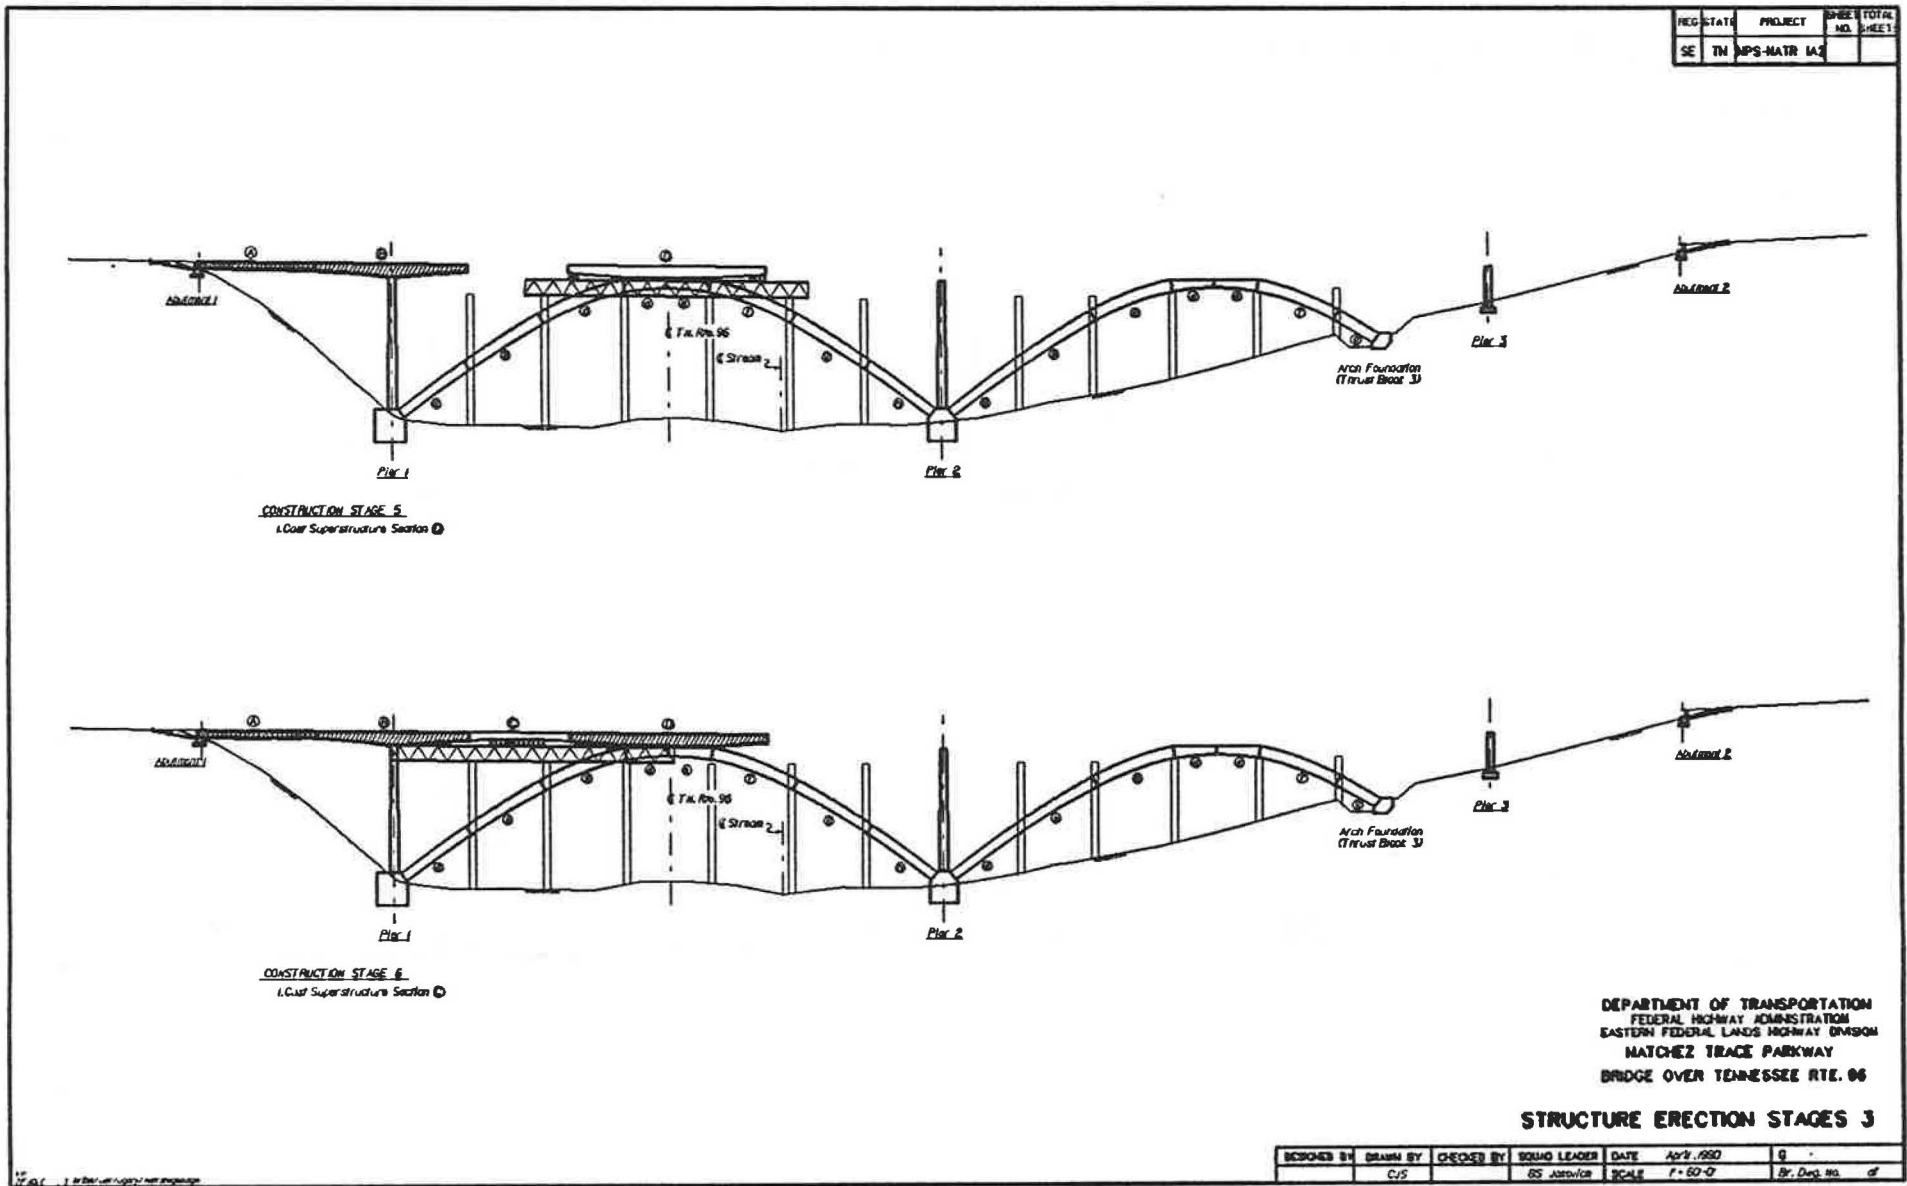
Construction stages 5 and 6 showing arch 1 (span 3) cantilever and span 2 closure placement
